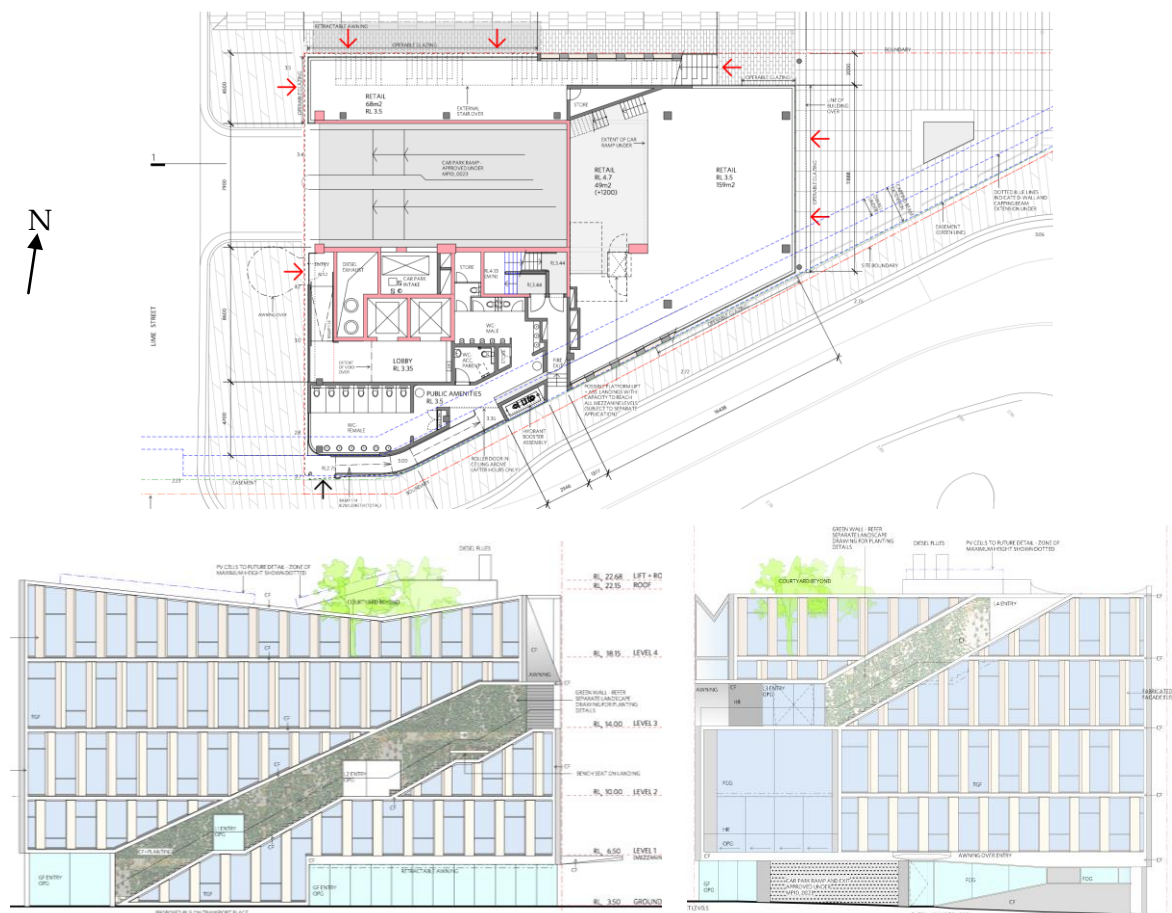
Ground floor plan (T), north elevation (BL), west elevation (BR) of the proposed Barangaroo South R7 development
